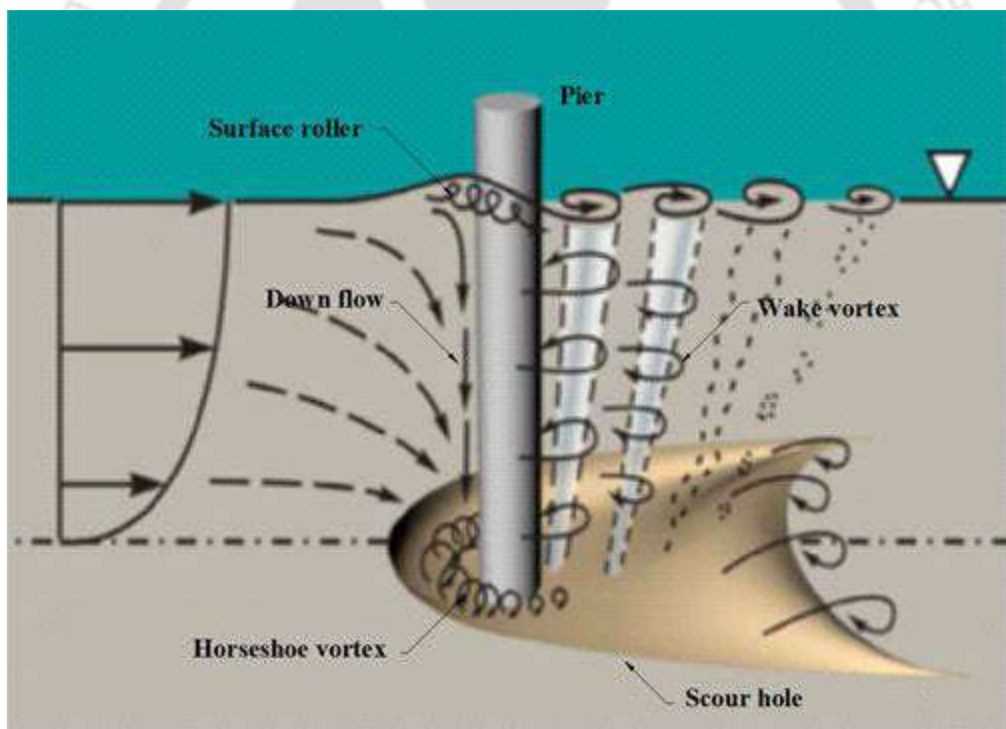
Schematic diagram of scour process around bridge piers, (Ettema and Melville, 2011)
